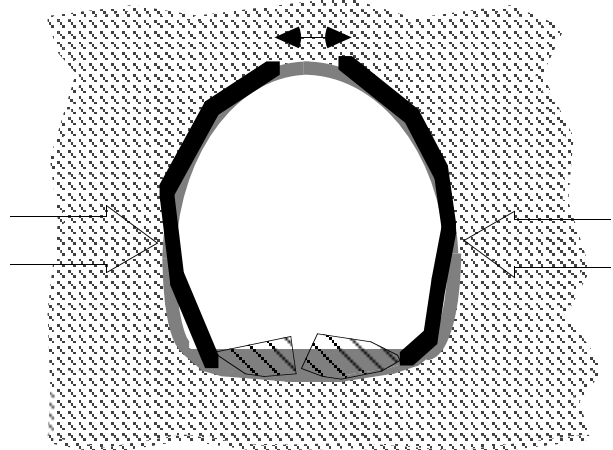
Distorted shape and buckling of pavement in Haguro Tunnel, Niigata-Chuetsu
